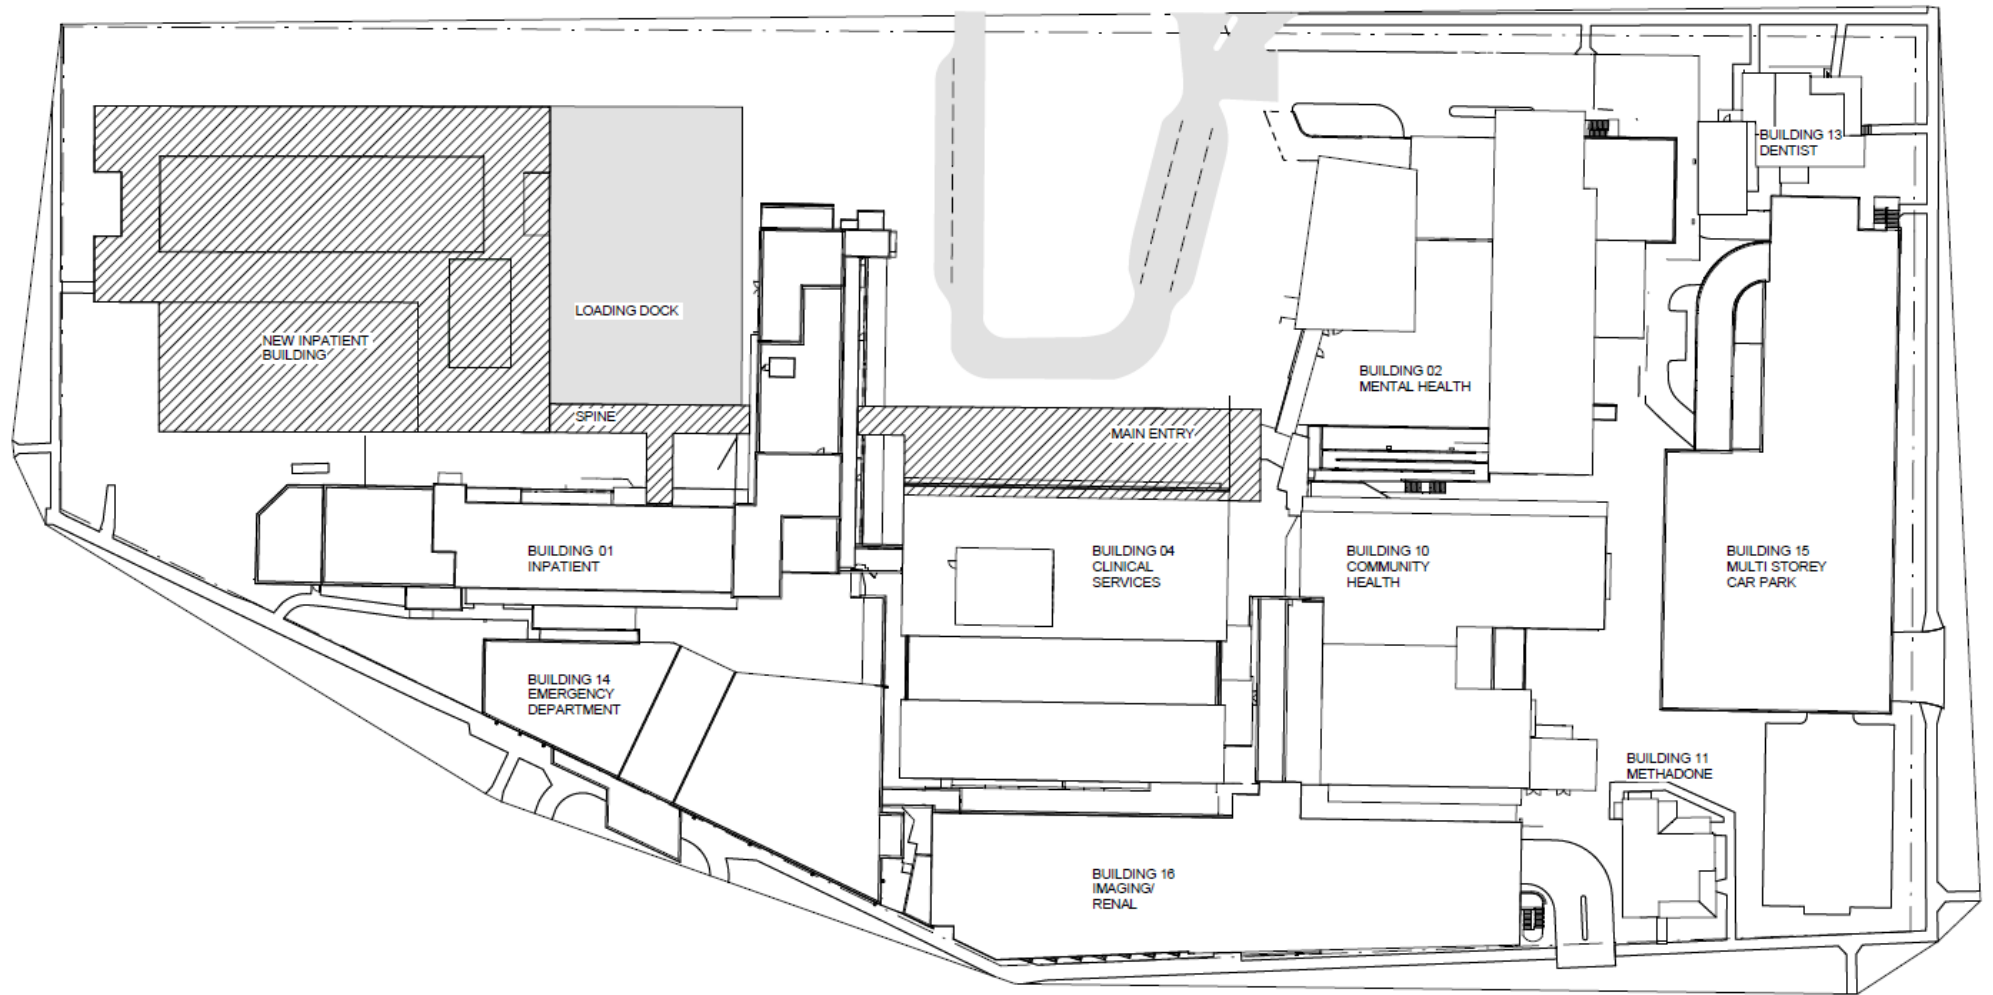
Site plan of proposed masterplan new works. Source: BNV
